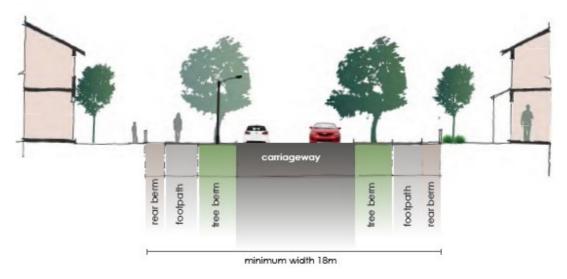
Indicative key local road cross section (source: Urban Acumen).
